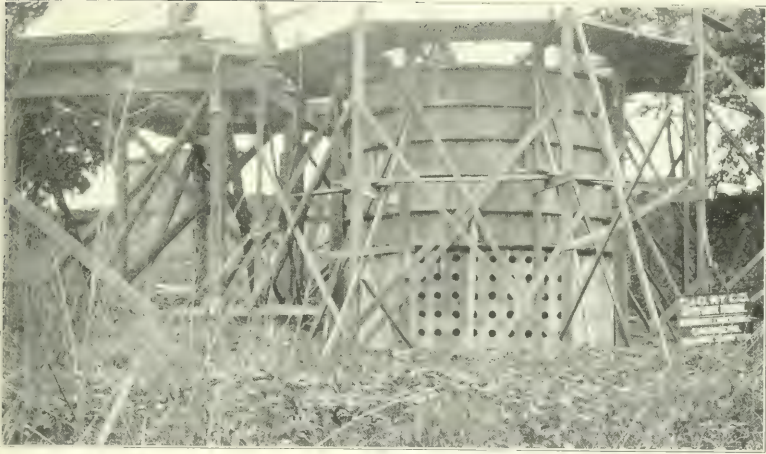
LOWER PART OF SHAFT BEFORE SINKING, SHOWING OPENINGS THROUGH WHICH WATER IS ADMITTED.
